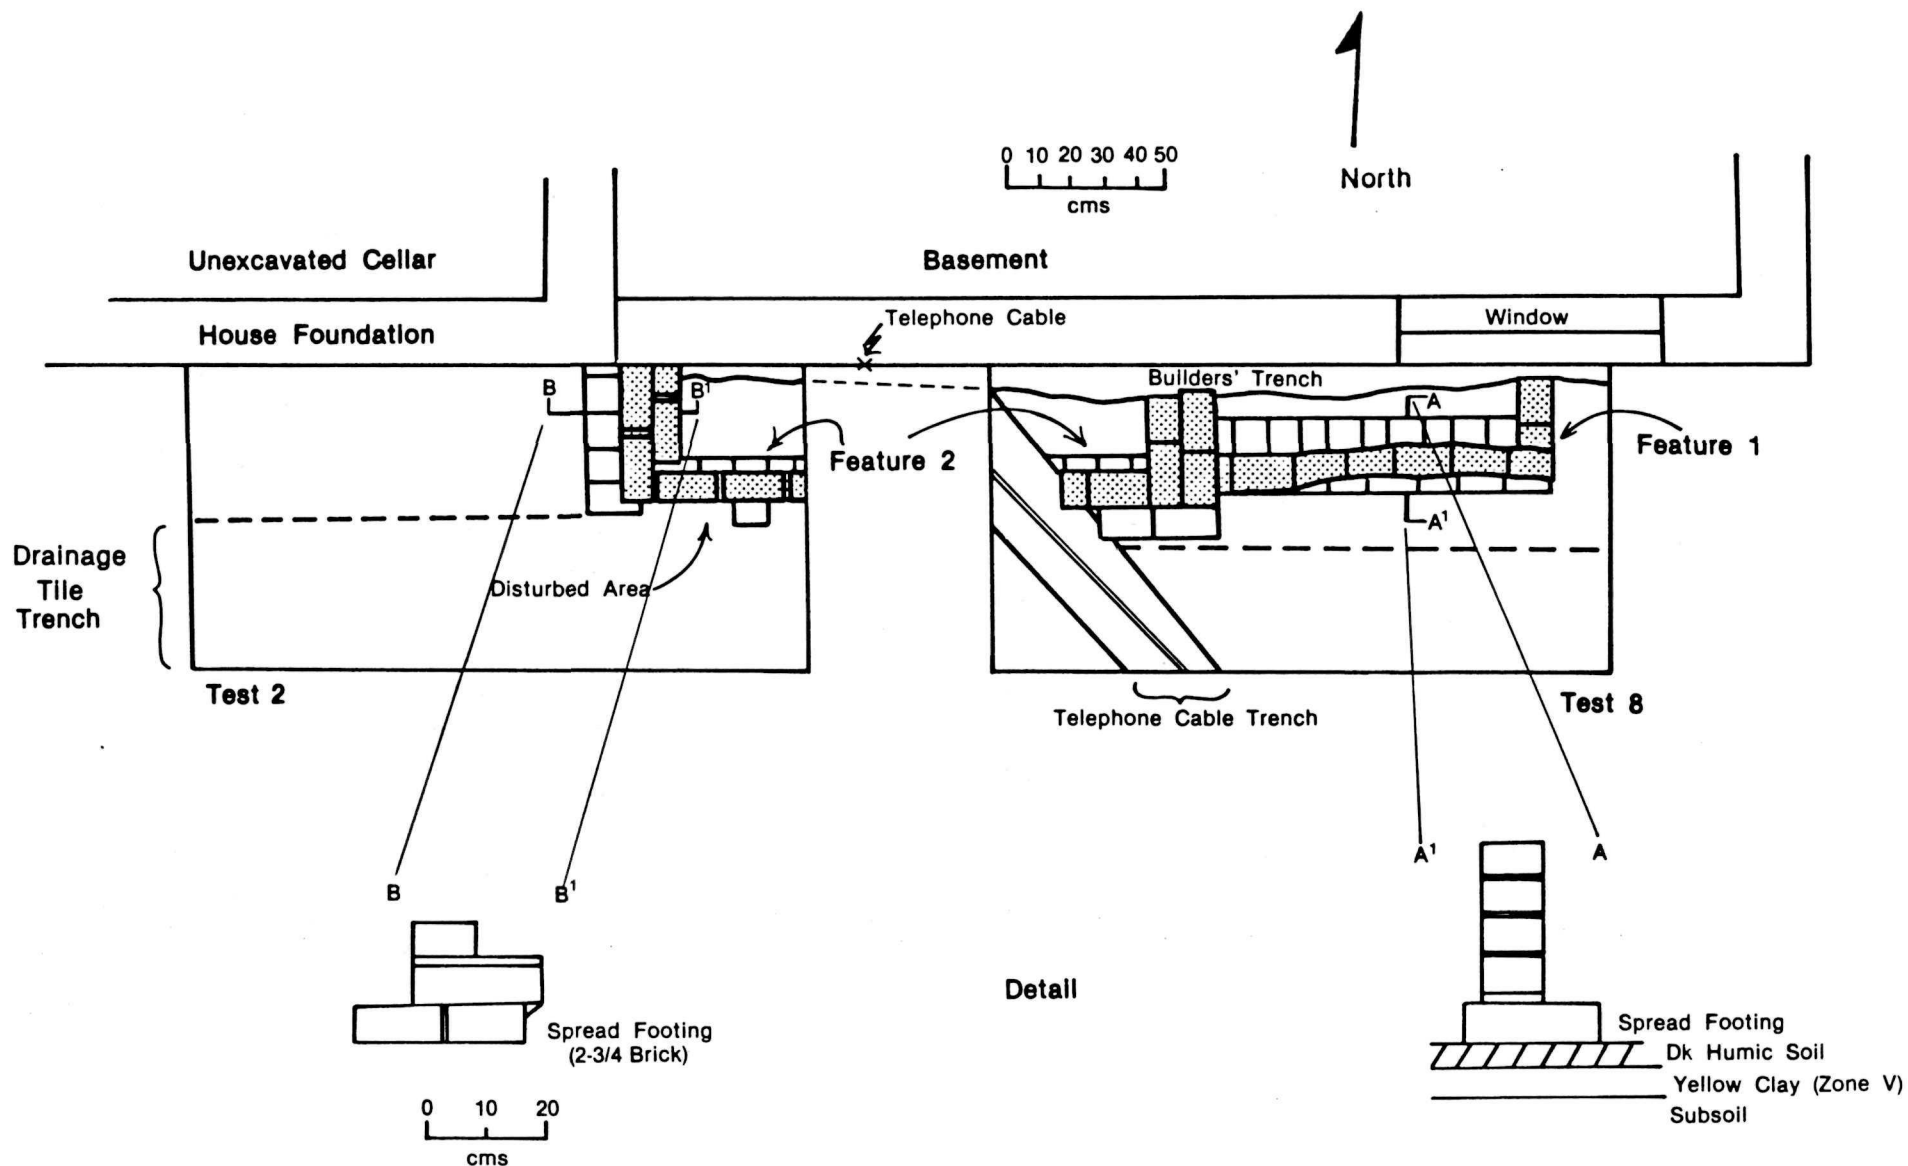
The Cook Site, Plan View of Tests 2 and 8.
